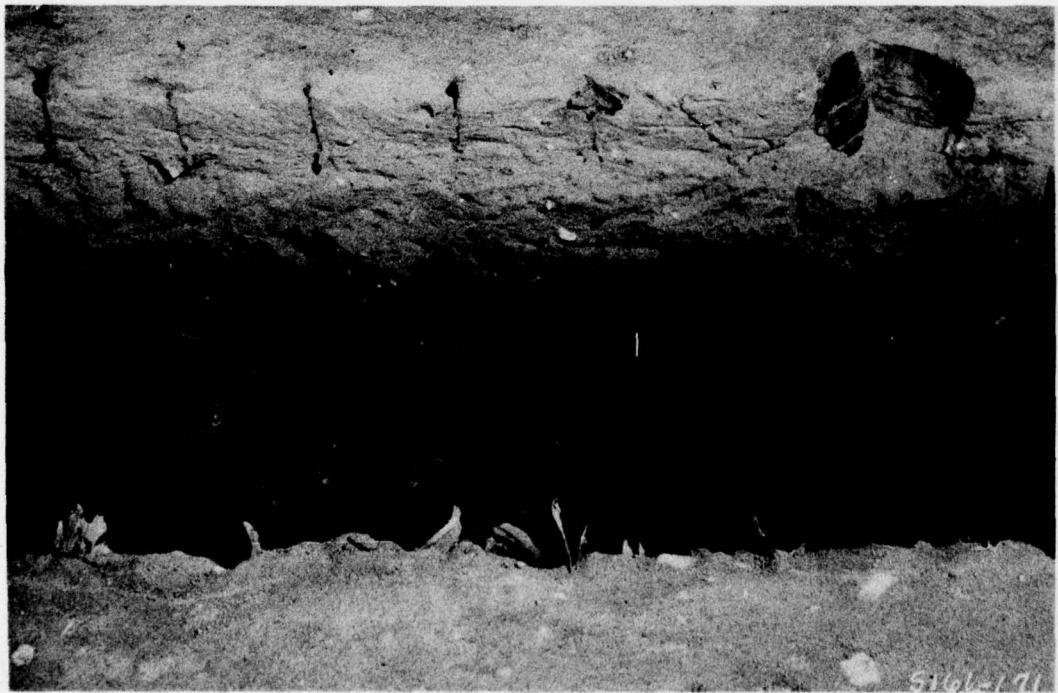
Trench in Test Section No. 5, item 1, after traffic
